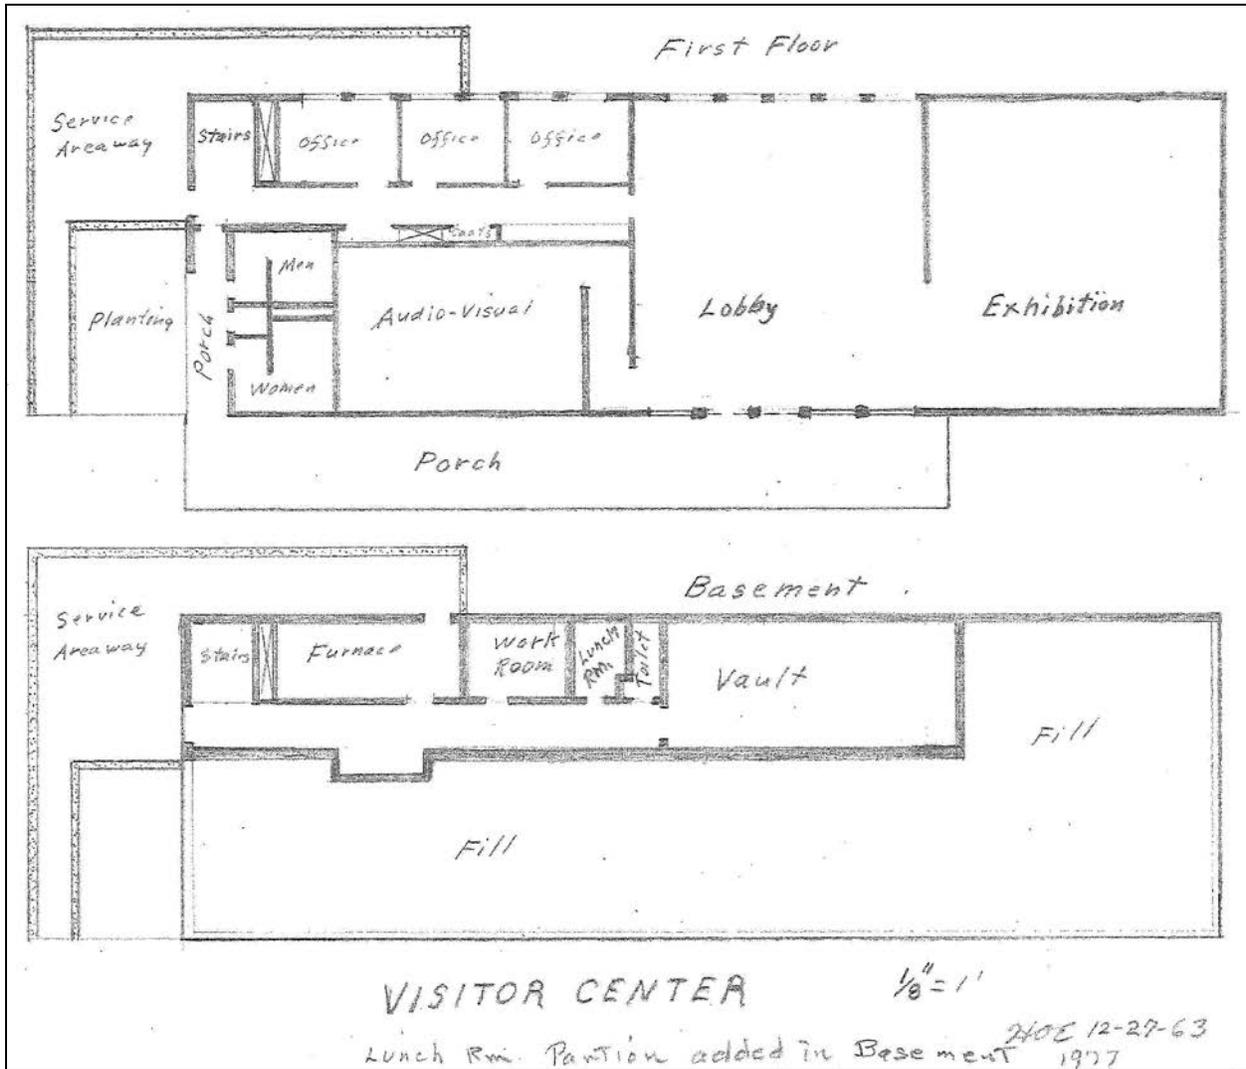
1977 Visitor Center floor plan, after the lunch room partition was added to the work room in the basement. Drawing on file in the Fort Vancouver National Historic Site Archives.
